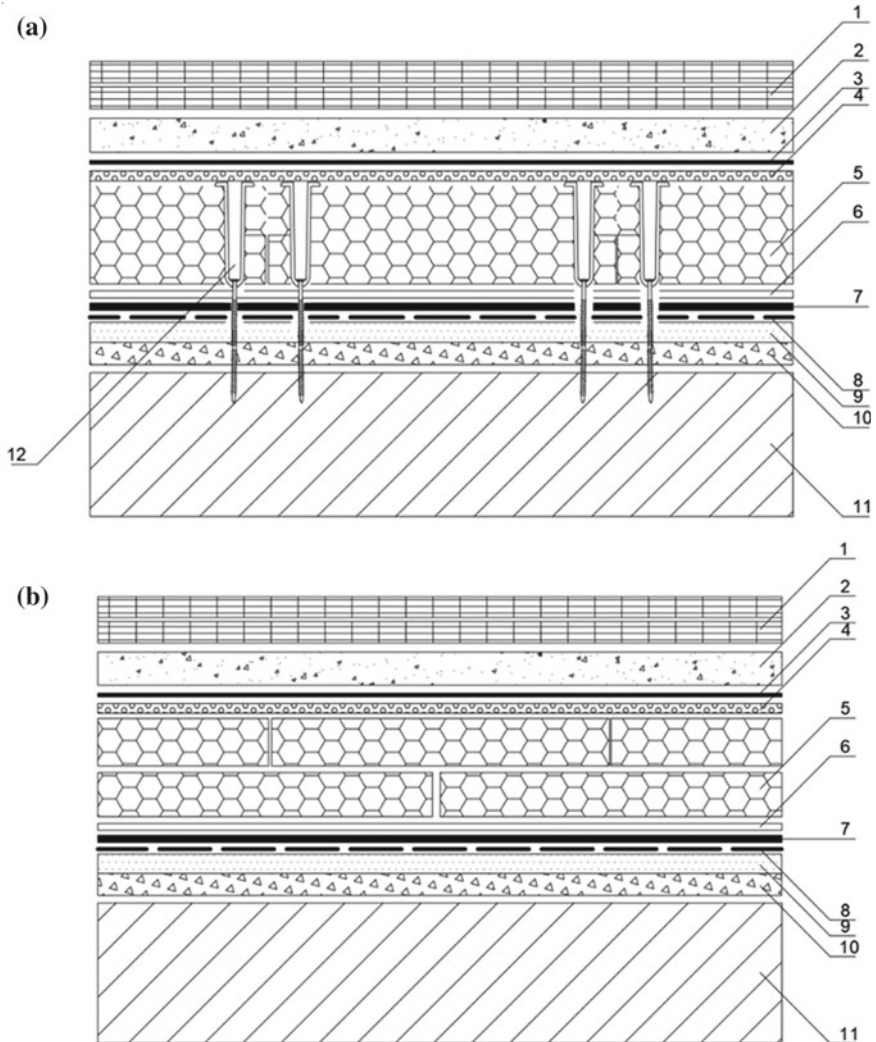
Roof system designs: a roof with mechanical fastening; b inversion ballast roof: 1—paving slab; 2—cement-sand reinforced covering; 3—separation layer; 4—drainage layer; 5—thermal insulation layer; 6—protective and drainage layer; 7—waterproofing in two layers; 8—bitumen primer; 9—reinforced cement-sand covering; 10—roof sloping; 11—concrete slab; 12—fired pin
